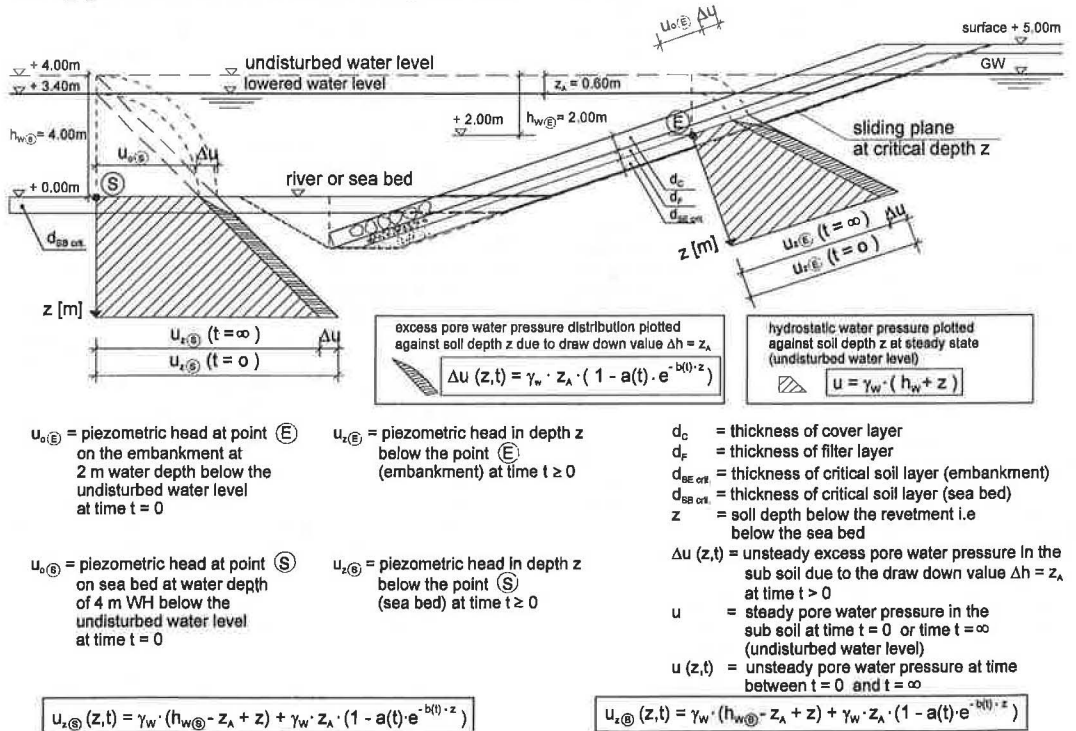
Definition sketch pore pressures along a sliding plane parallel to the slope for a rip-rap revetment.
